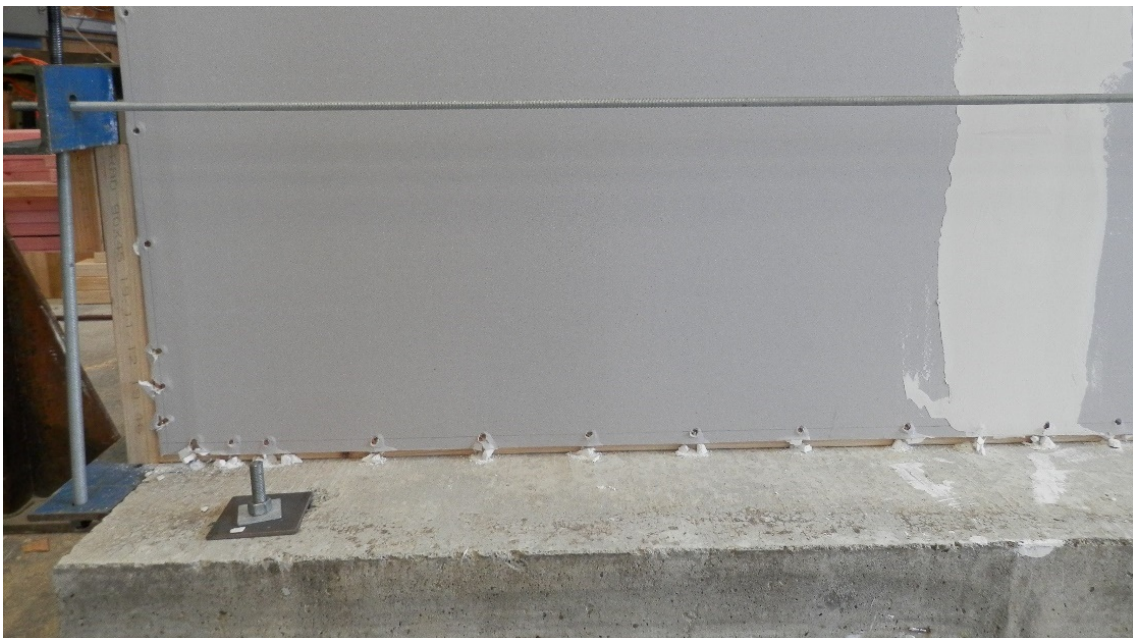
Final appearance after racking on a plasterboard wall of 2.4 m long.
